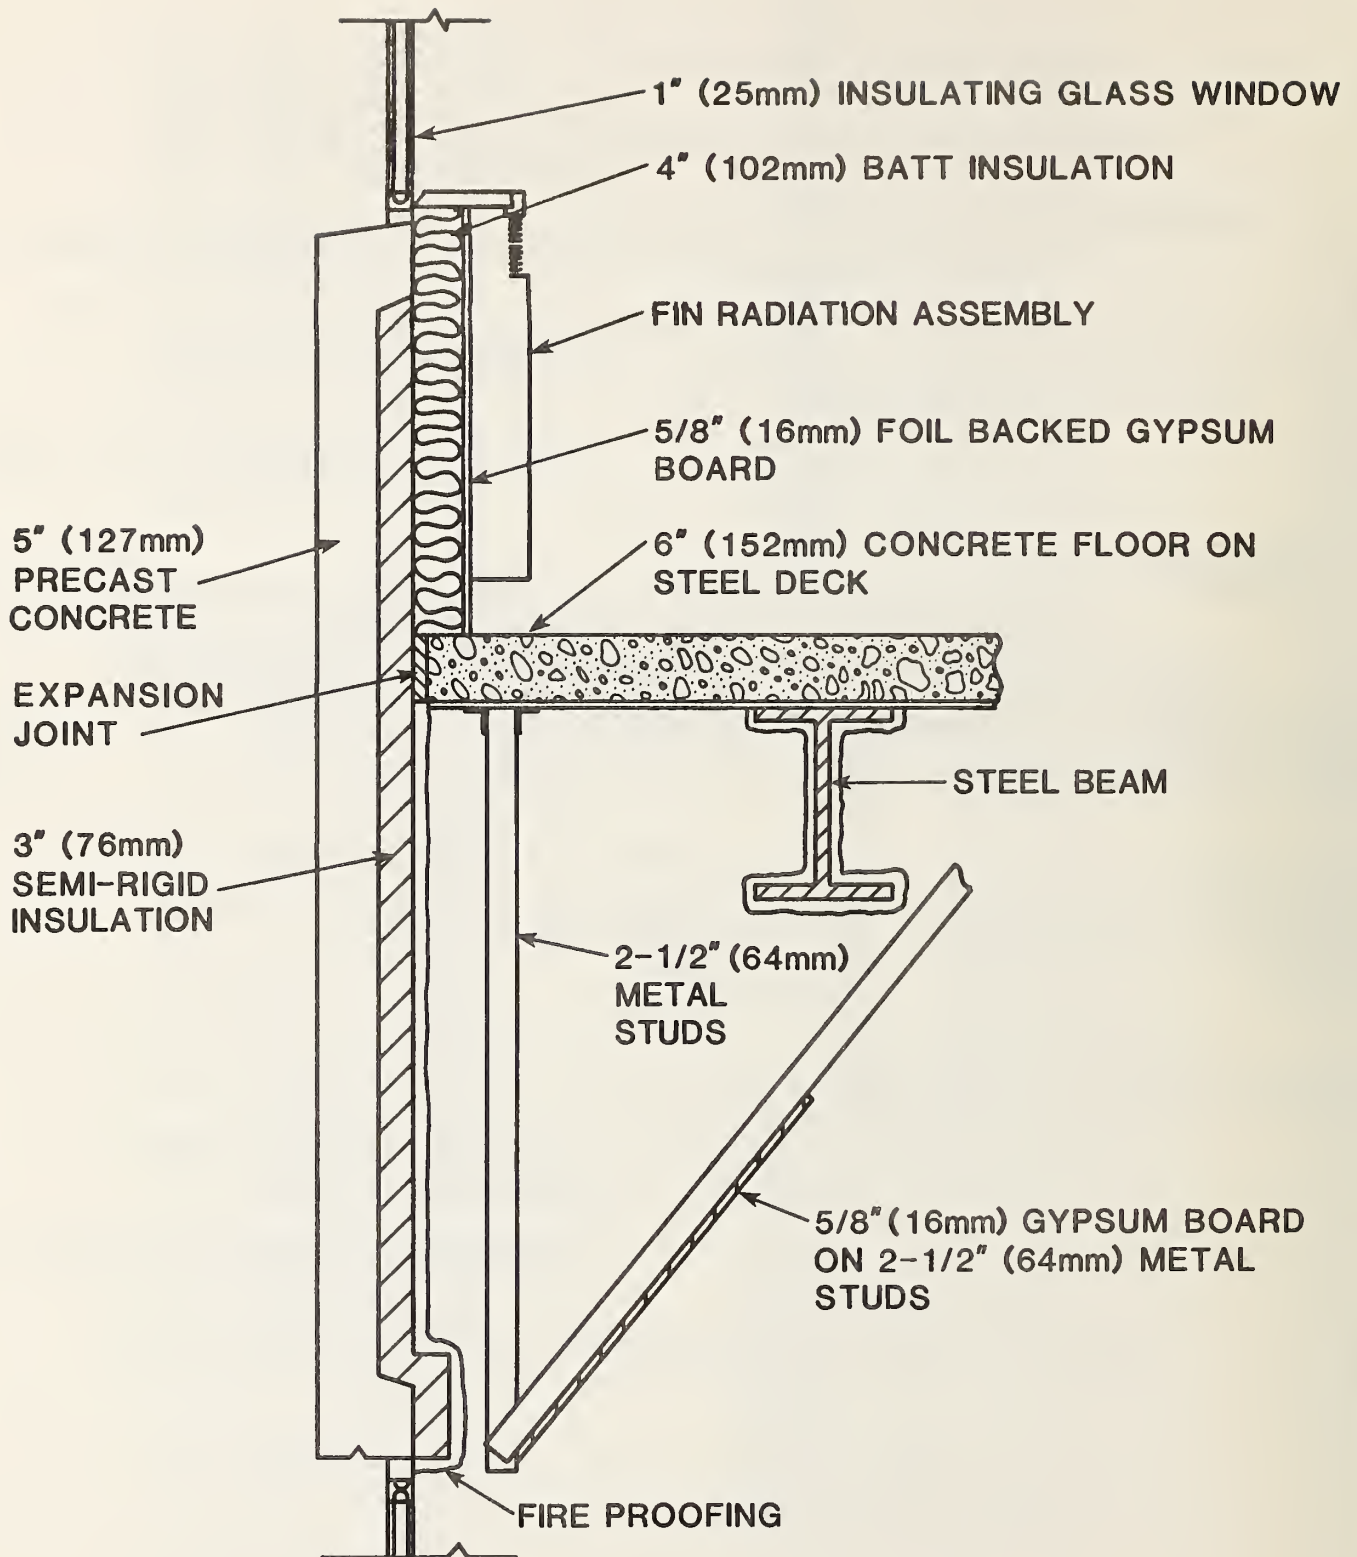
Construction Details of the Exterior Wall in the Anchorage Office Building
